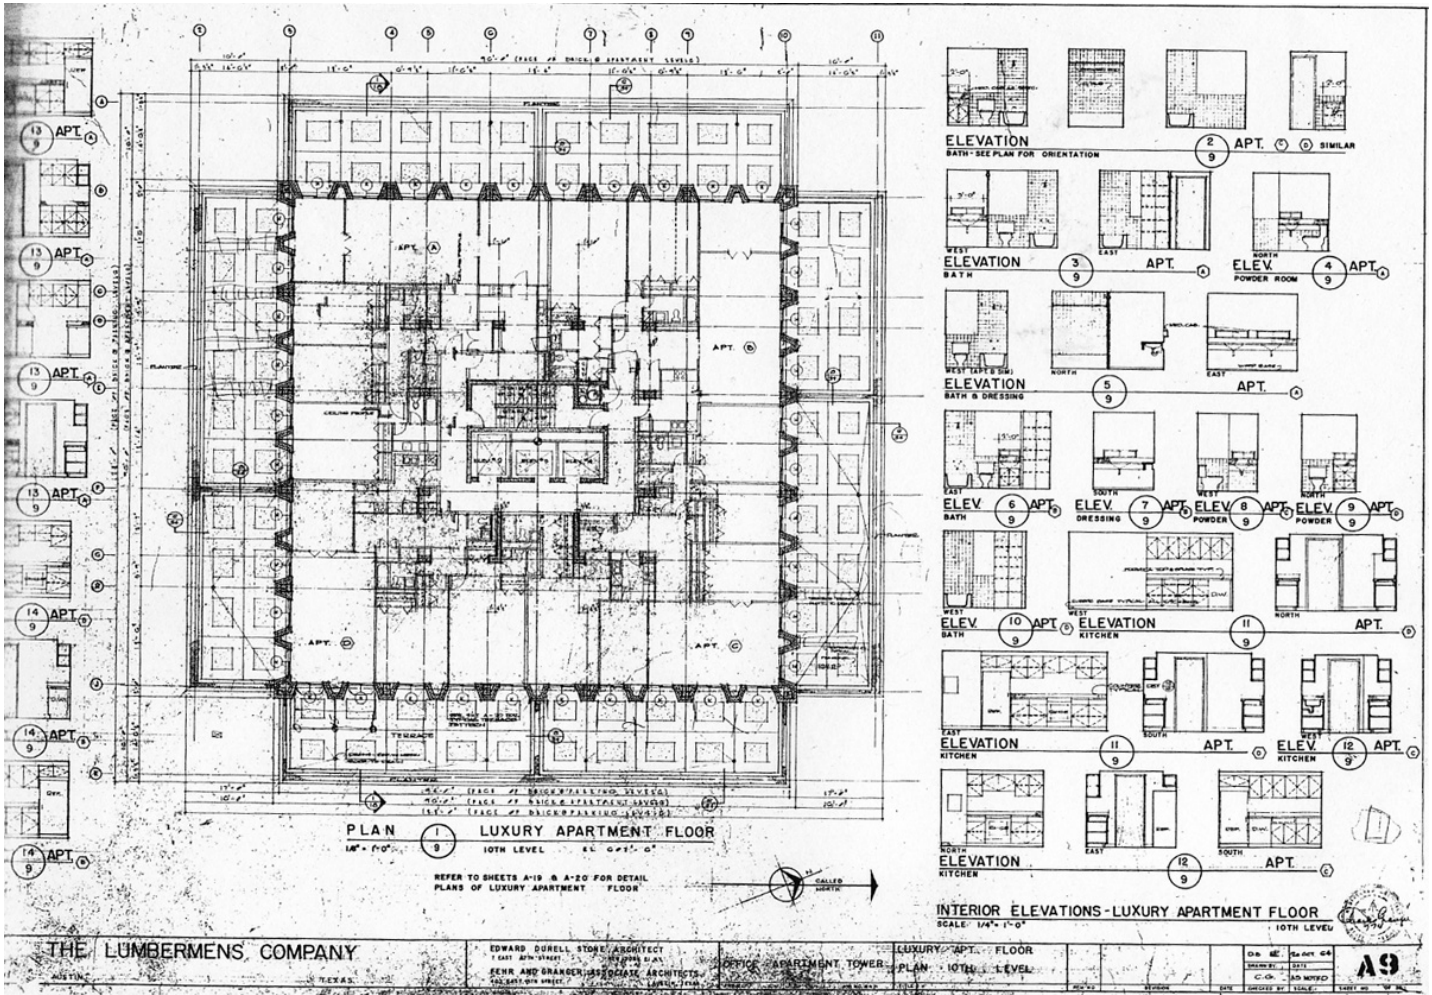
Plan for Level 10, luxury apartment floor with terraces.
